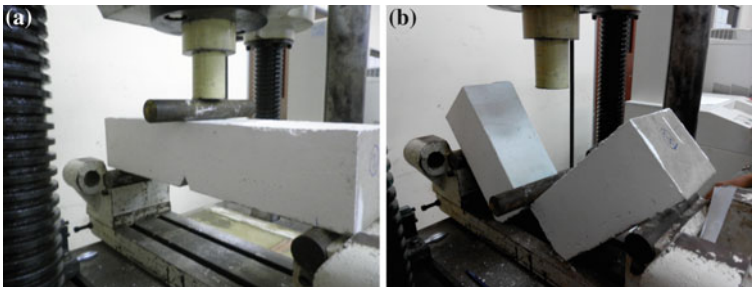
Three-point bending test: a test setup and b failure of the beam specimen
